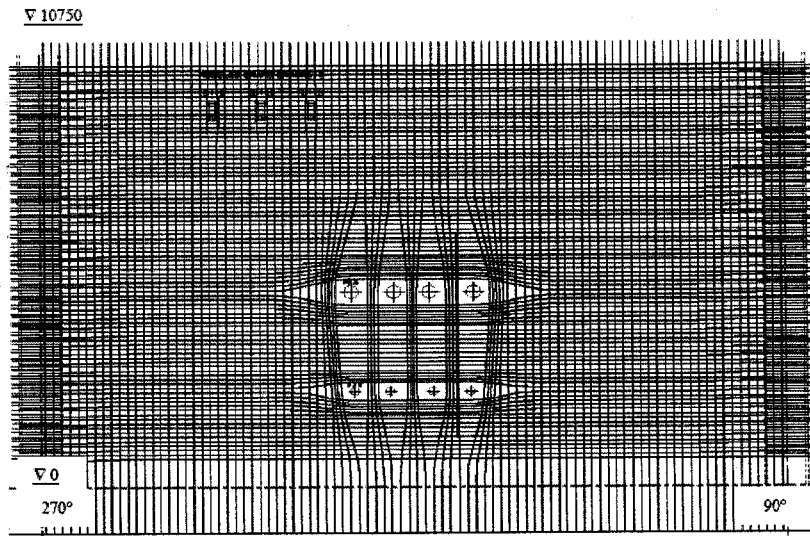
Layout of the penetrations (elevation, outside containment).
